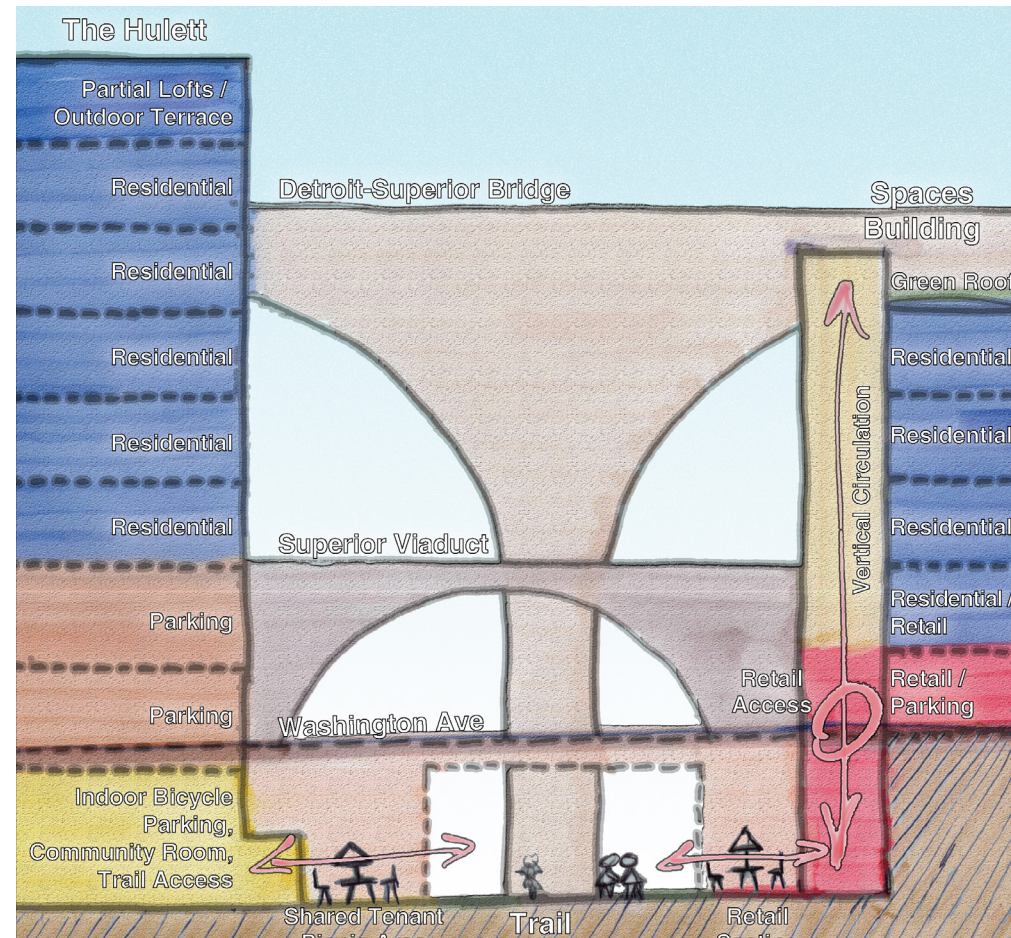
SECTION THROUGH HULETT, TRAIL AND SPACES BUILDING
